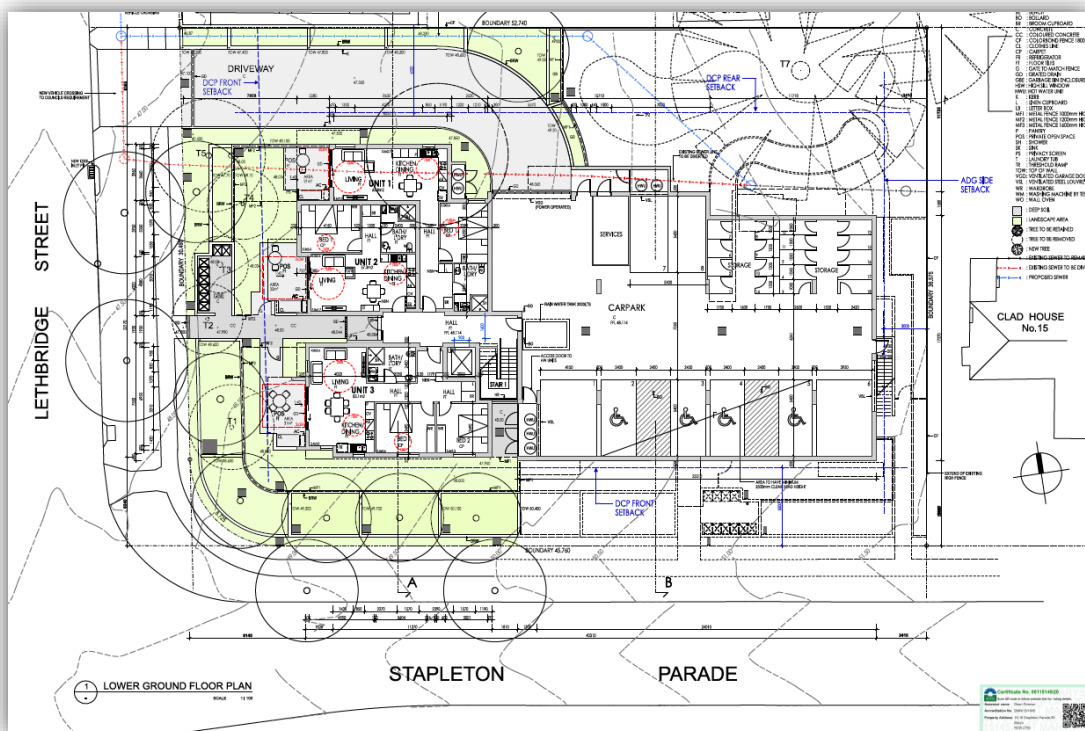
Extract from Architectural Plans – Lower Ground Floor (Source: DKT Architects, September 2024)
